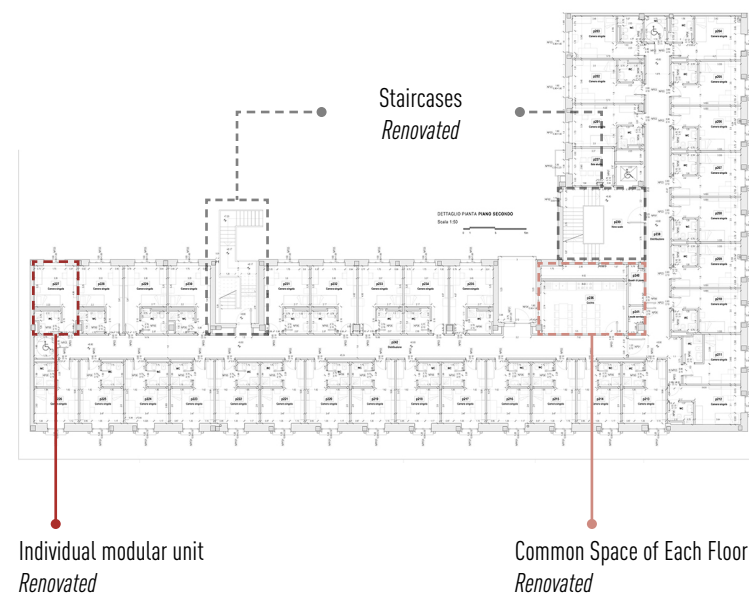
Second Floor Plan of Collegio Einaudi, Sezione Mole
